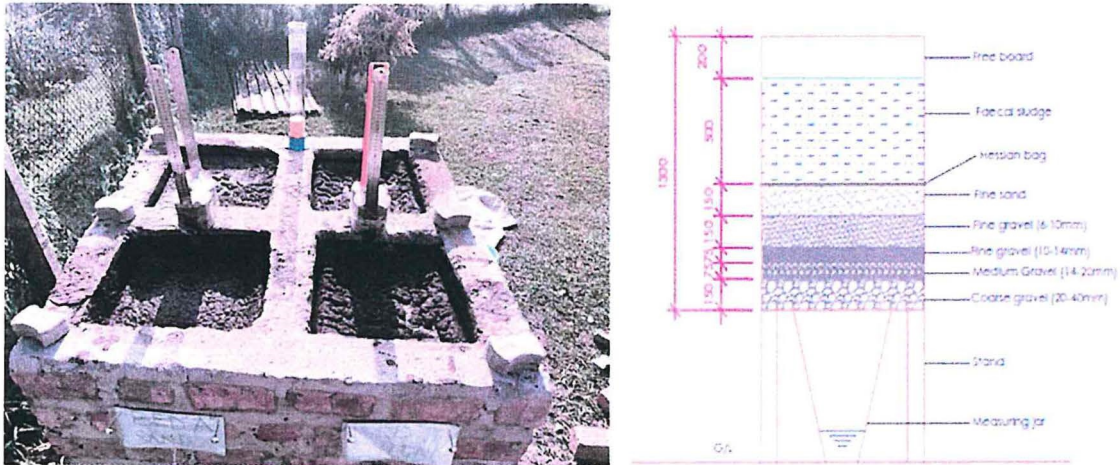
Aerial view of a complete setup of all beds loaded with FS and schematic diagram of the constructed beds
